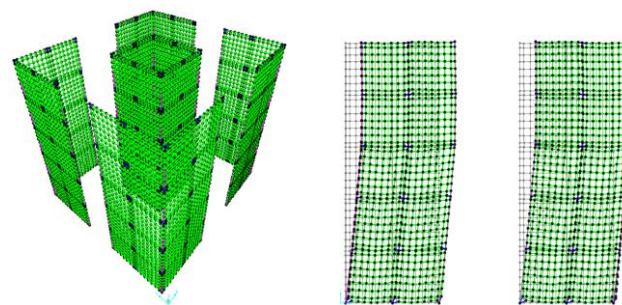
FE model of hybrid-building (left) and the first vibration mode -entire façade- (right)
